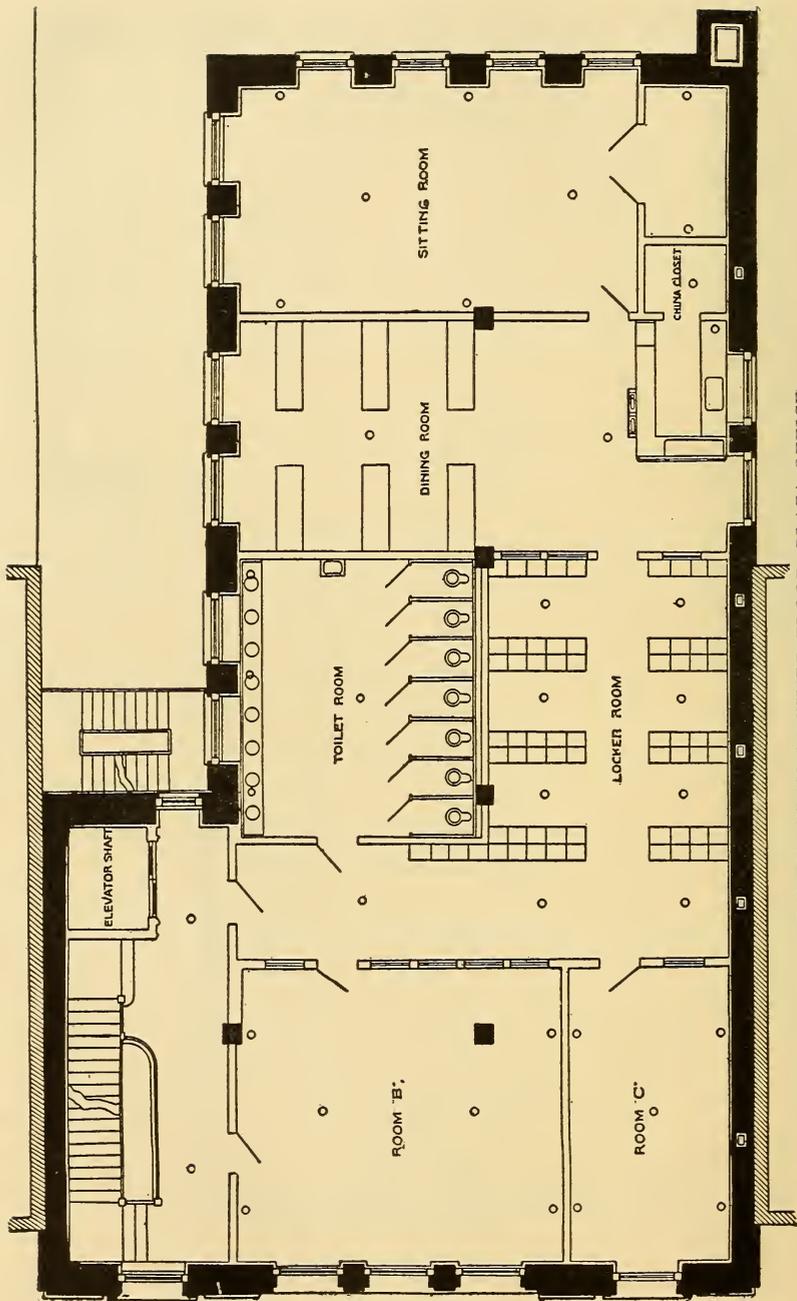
PLAN OF THIRD FLOOR—PLAZA OFFICE,
